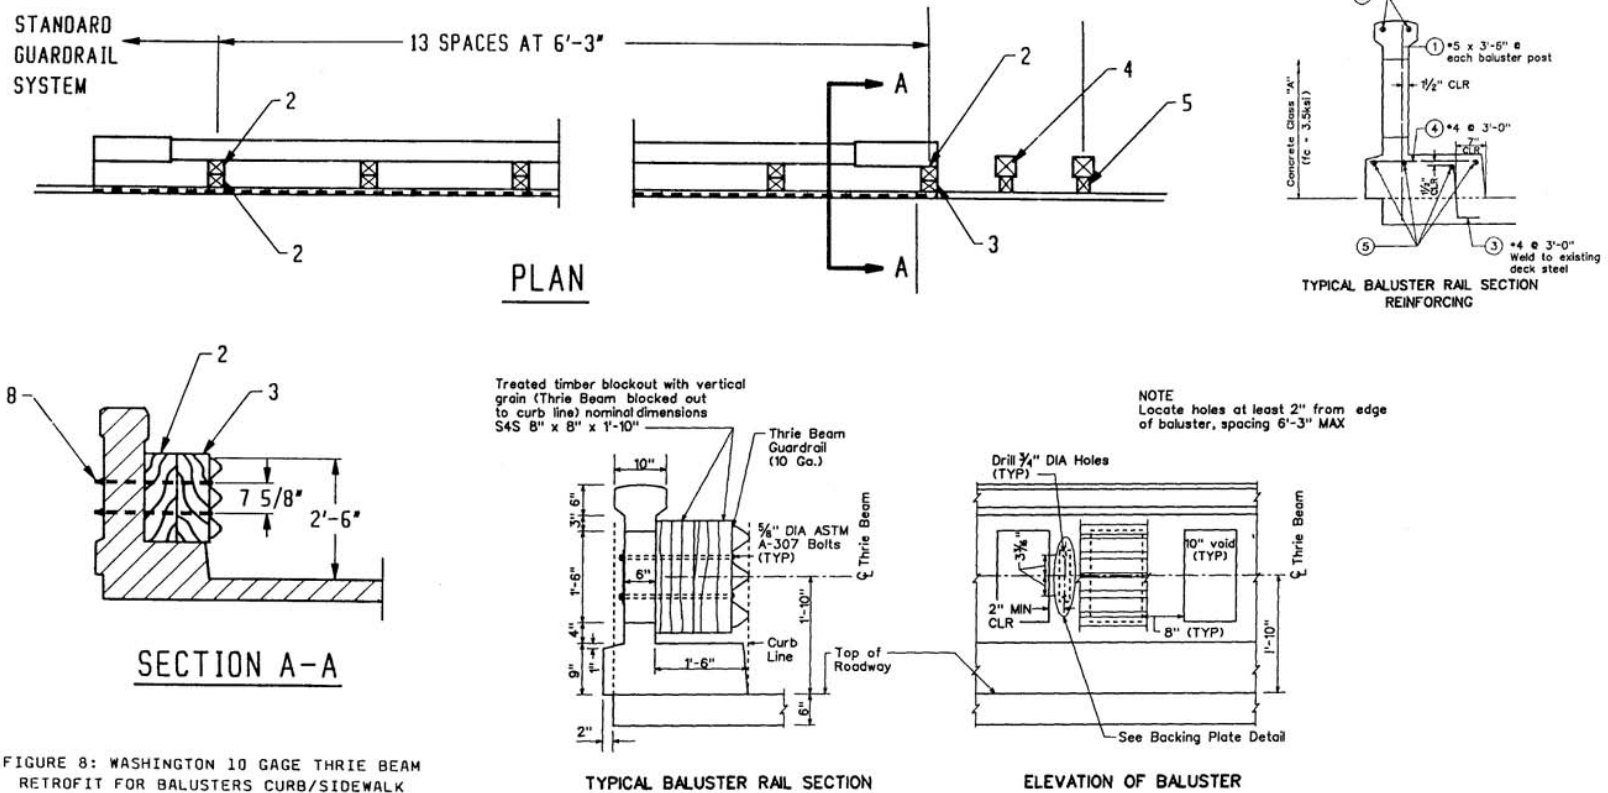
WASHINGTON 10 GAGE THRIE BEAM RETROFIT FOR BALUSTERS CURB/SIDEWALK
